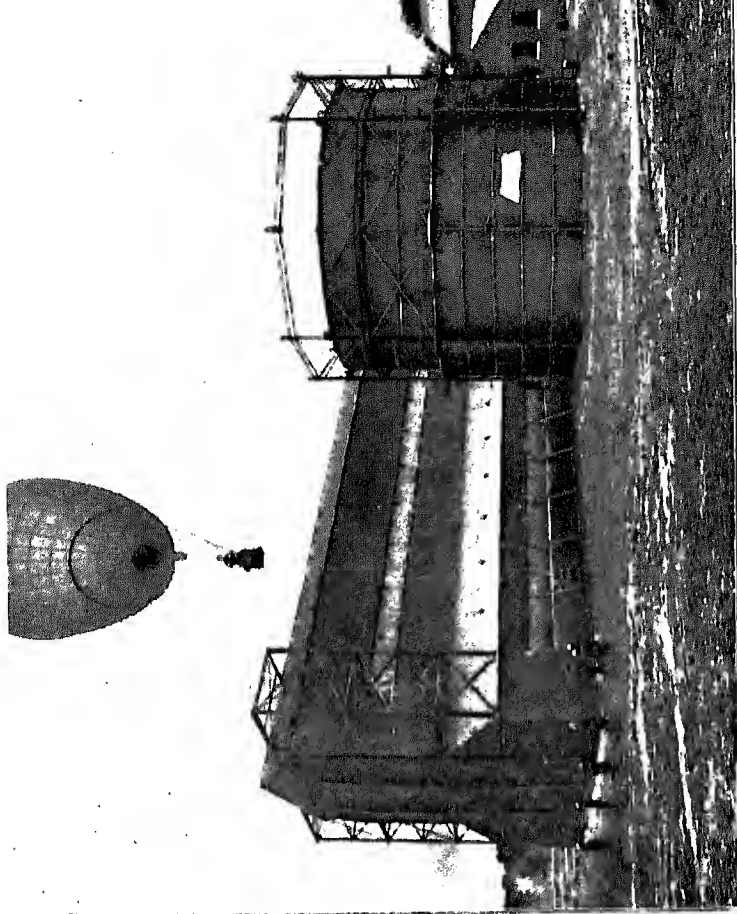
STEEL BALLOON HOUSE, GASOMETER AND HYDROGEN GENERATING PLANT, SIGNAL CO.
